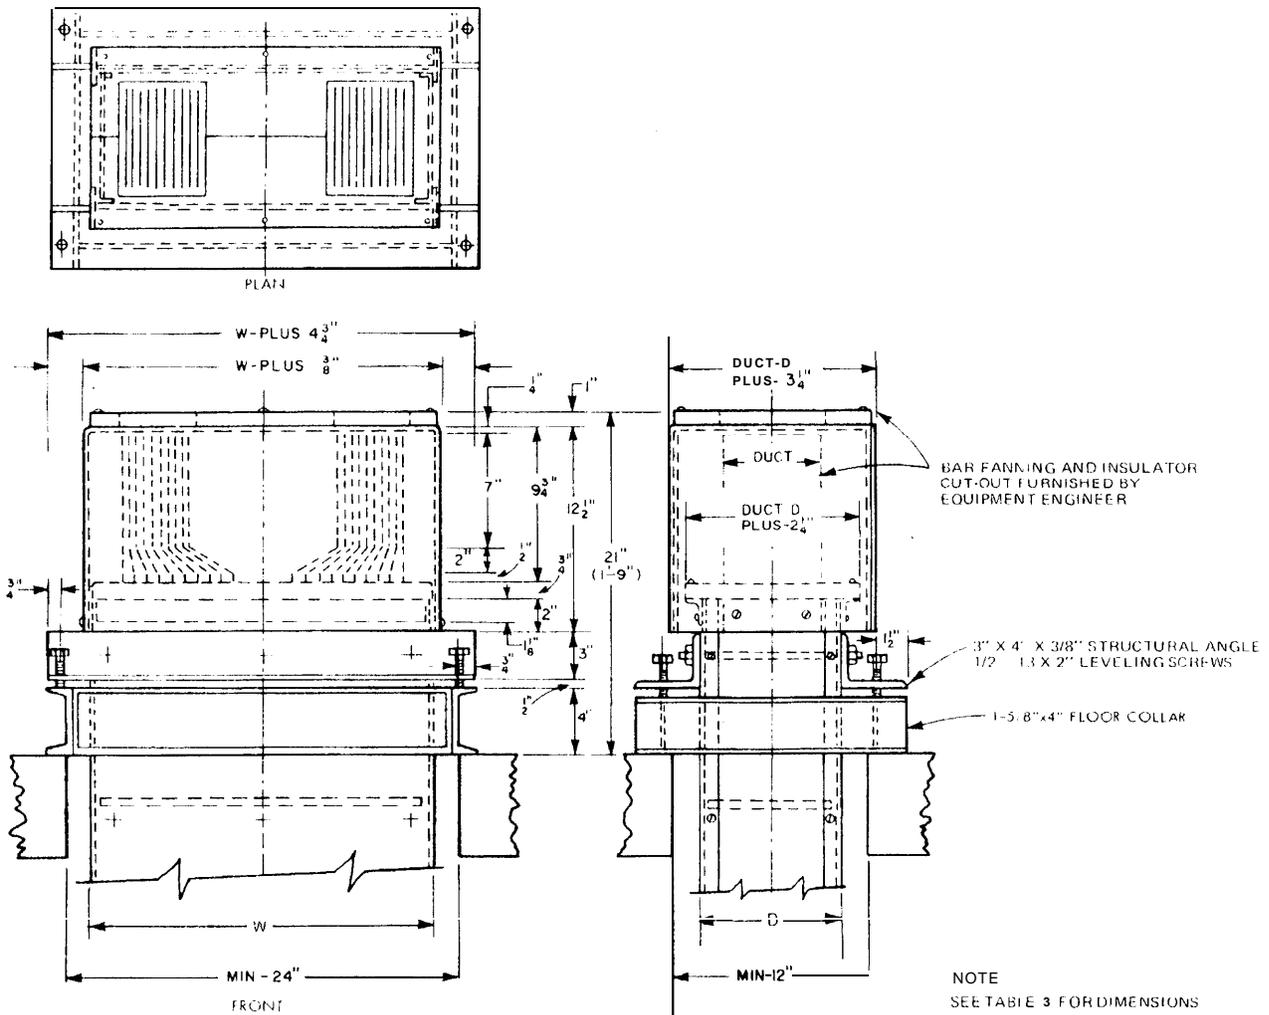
Power Board Floor Entrance - Rigid (Above Floor).
